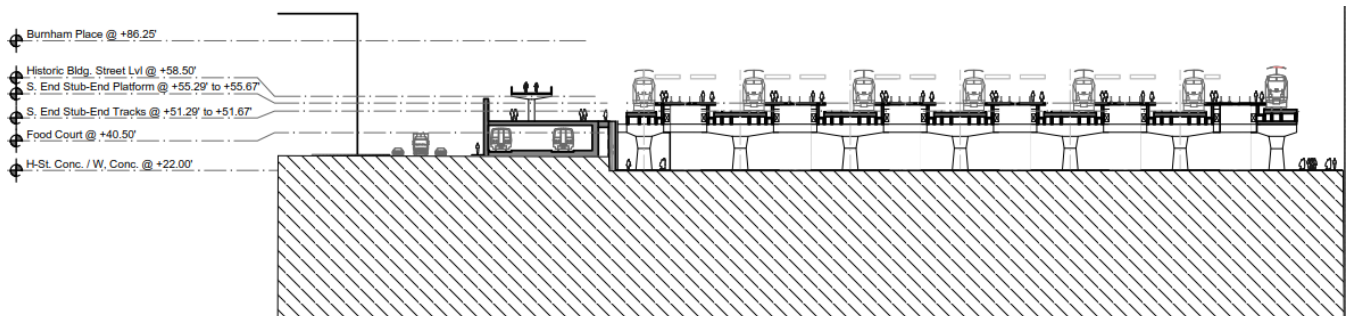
ALT A-C No Overbuild Deck Design Section View
